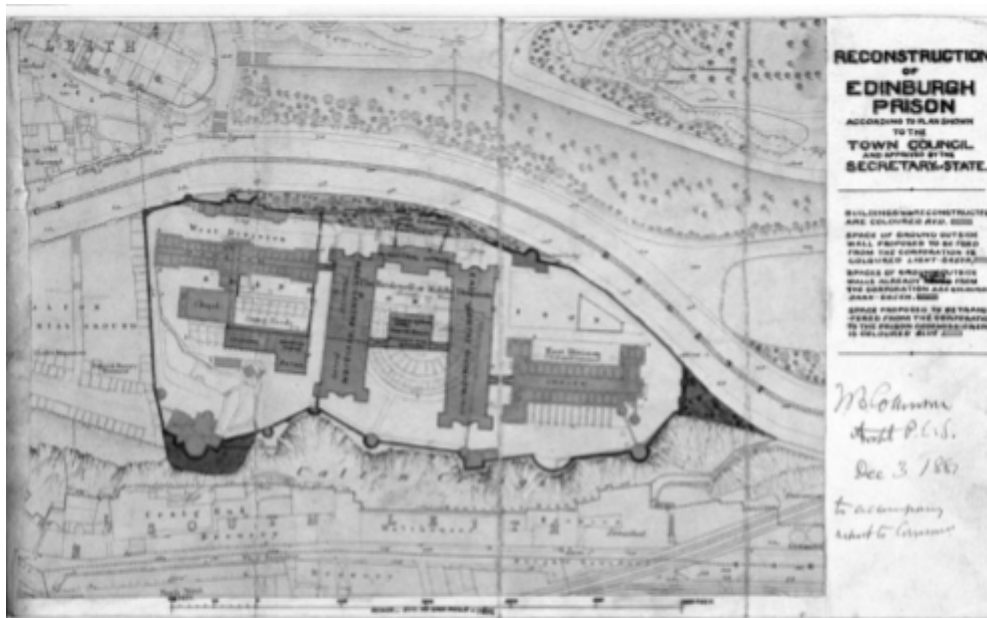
Calton Jail Complex Ground Plan, overlaying the Bridewell Ground plan, 1887.
